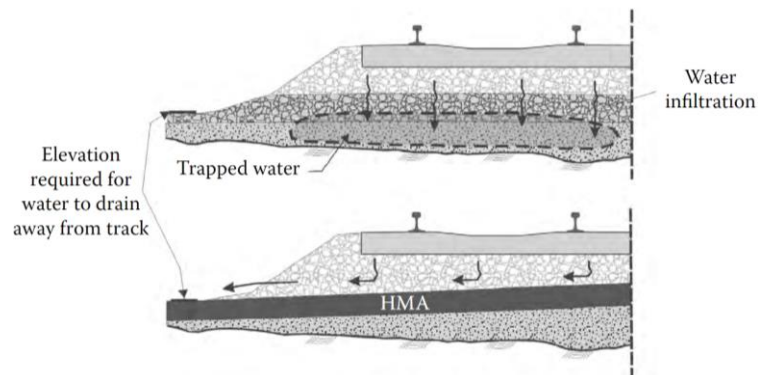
Using hot mixed asphalt (HMA) to raise drainage surface within track substructure (Li et al. 2016)
